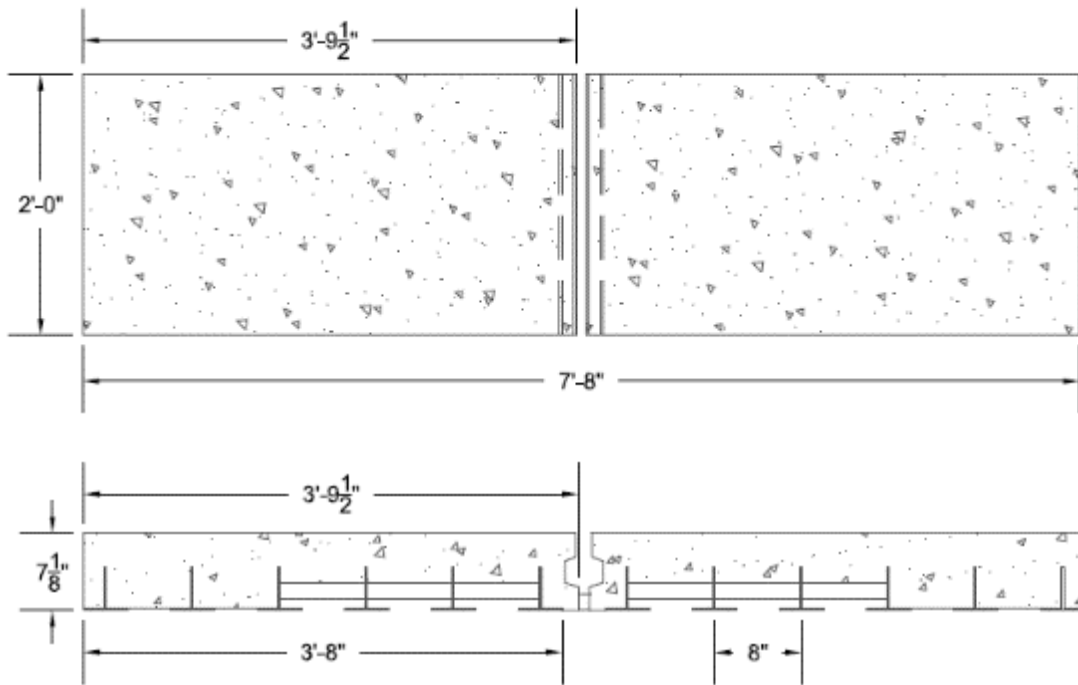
Unreinforced Shear Key Jointed Panels Plan and Elevation
